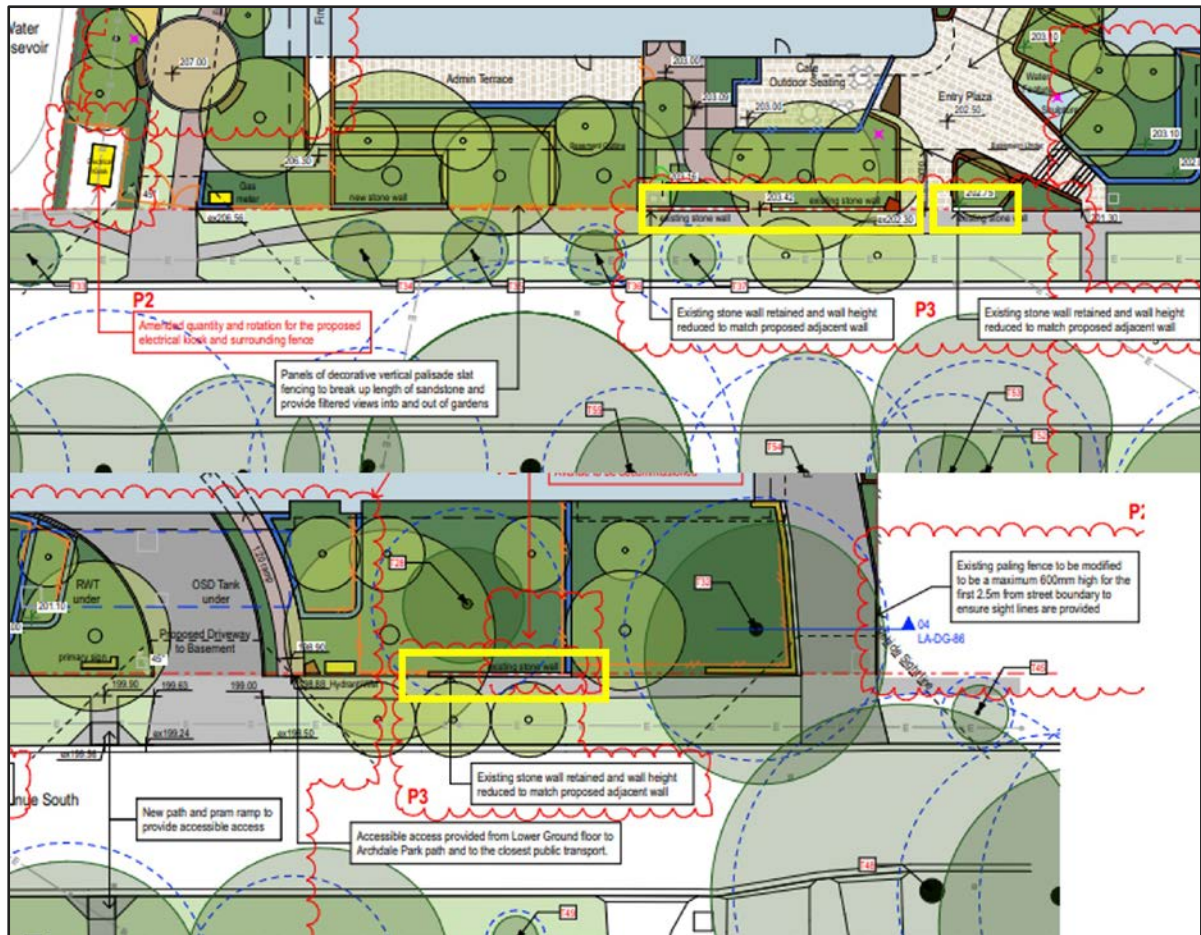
| Proposed retention of sections of the existing sandstone wall along Neringah Avenue South (Base Image Source: Applicant's landscape plans)
